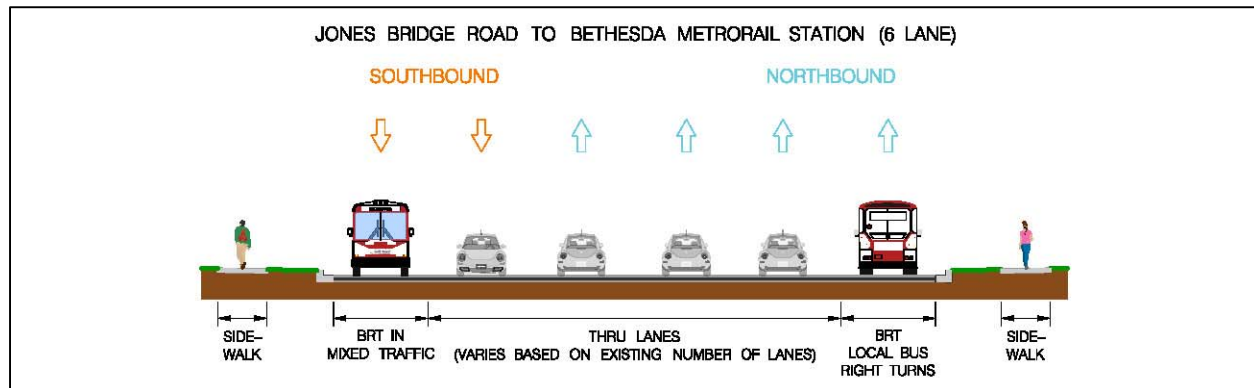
Alternative 4B - Section 1: Bethesda - PM Peak Period - Jones Bridge Road to Bethesda Metrorail Station
